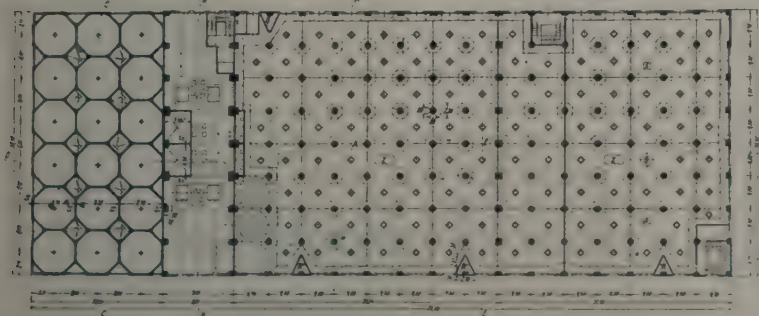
FLOOR PLAN OF THE BUDAPEST GRAIN STORAGE
